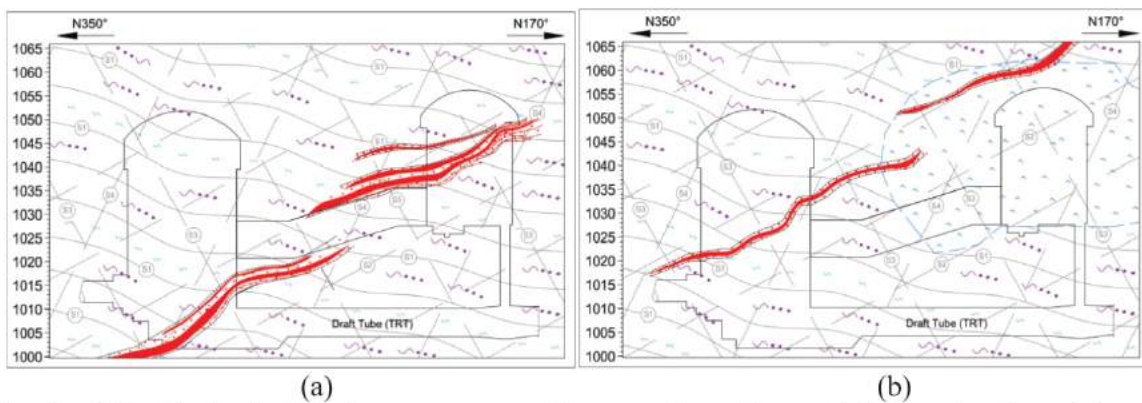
a & b - Geological section across power house and transformer hall showing disposition of shear/fractured zone
